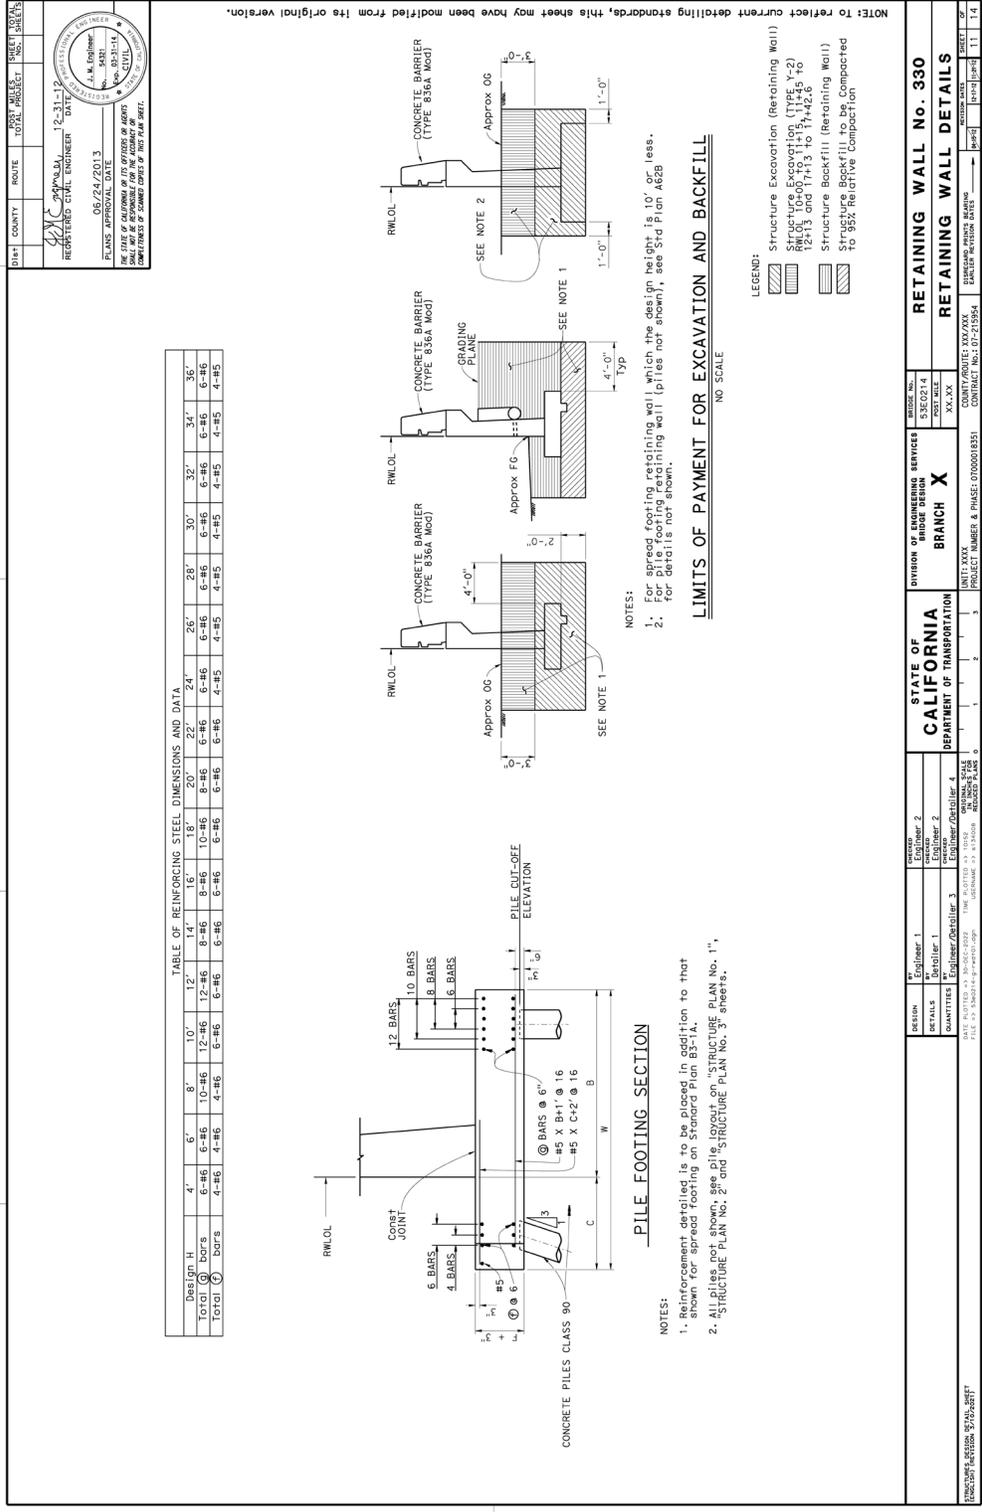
A.B.3 Soldier Pile Retaining Wall Detailing Example 3
